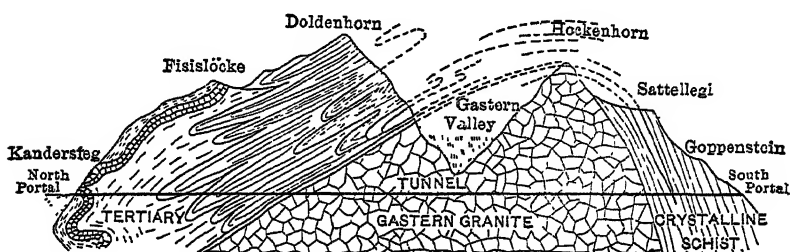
IDEALIZED GEOLOGICAL CROSS-SECTION NEAR THE TUNNEL-AXIS, LOETSCHBERG TUNNEL.
